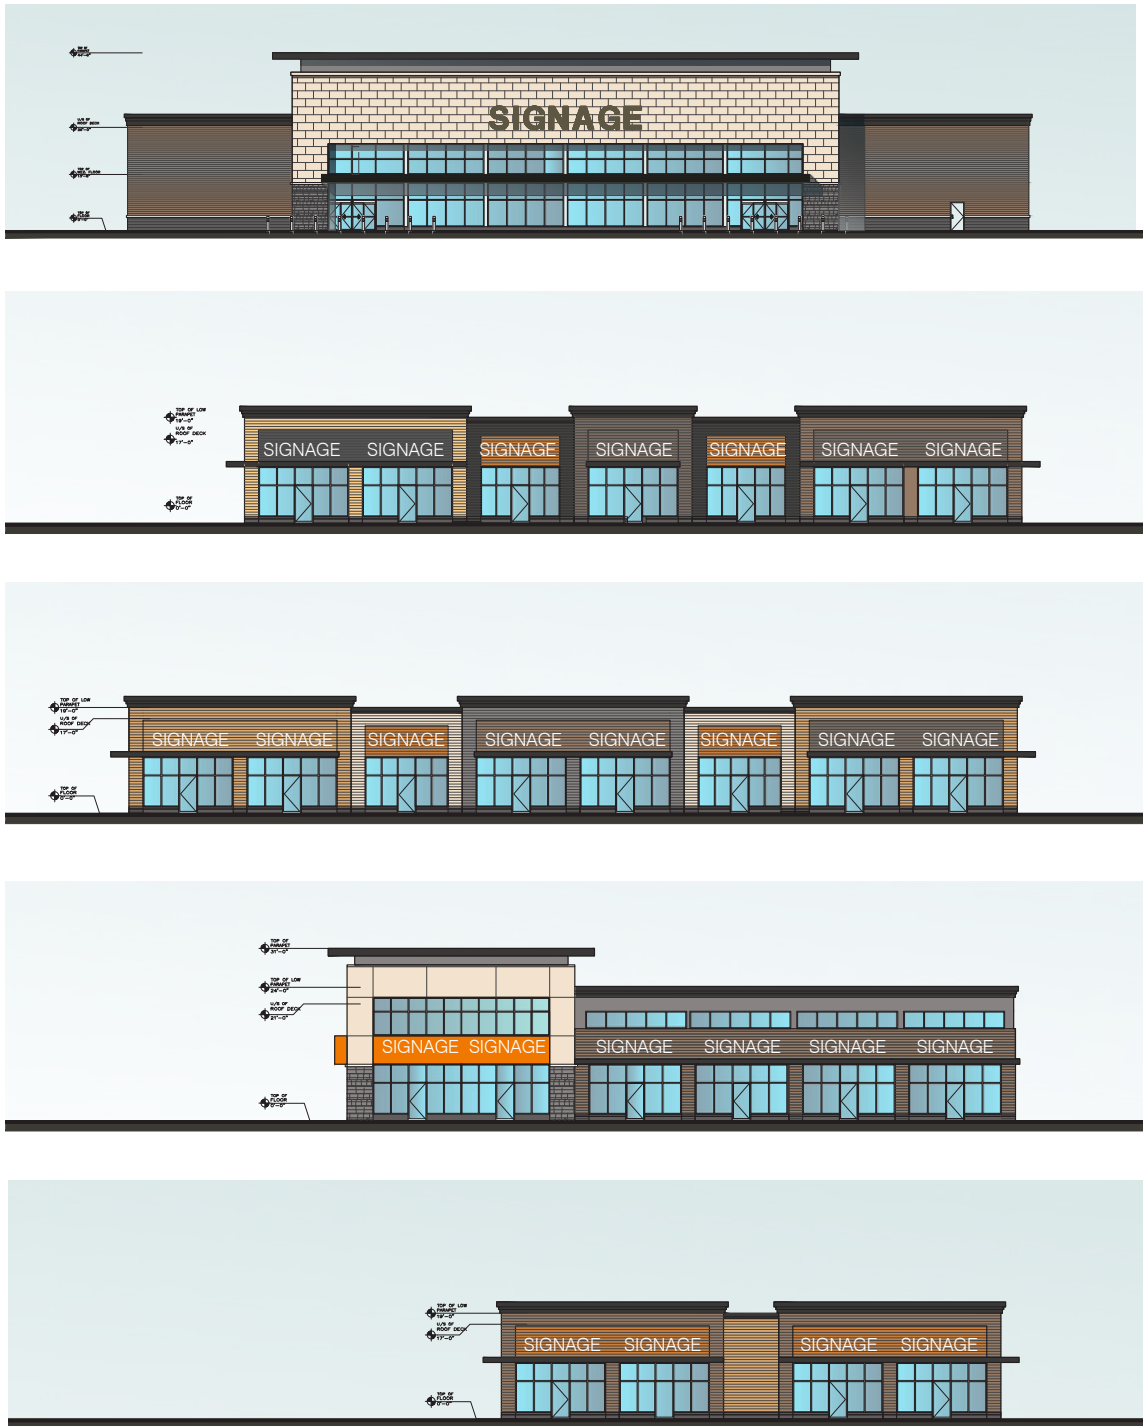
Building elevations illustrating building heights and articulation and intended material along the Site primary frontages
